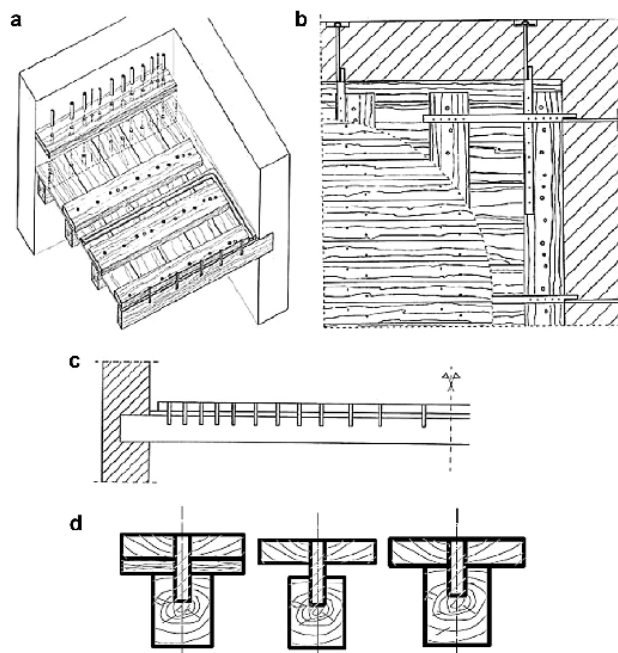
Strengthening intervention timber-to-timber connected with timber pegs: (a) axonometry, (b) plan, (c) section, (d) different type of cross section, with and without existing boarding [2][3].
